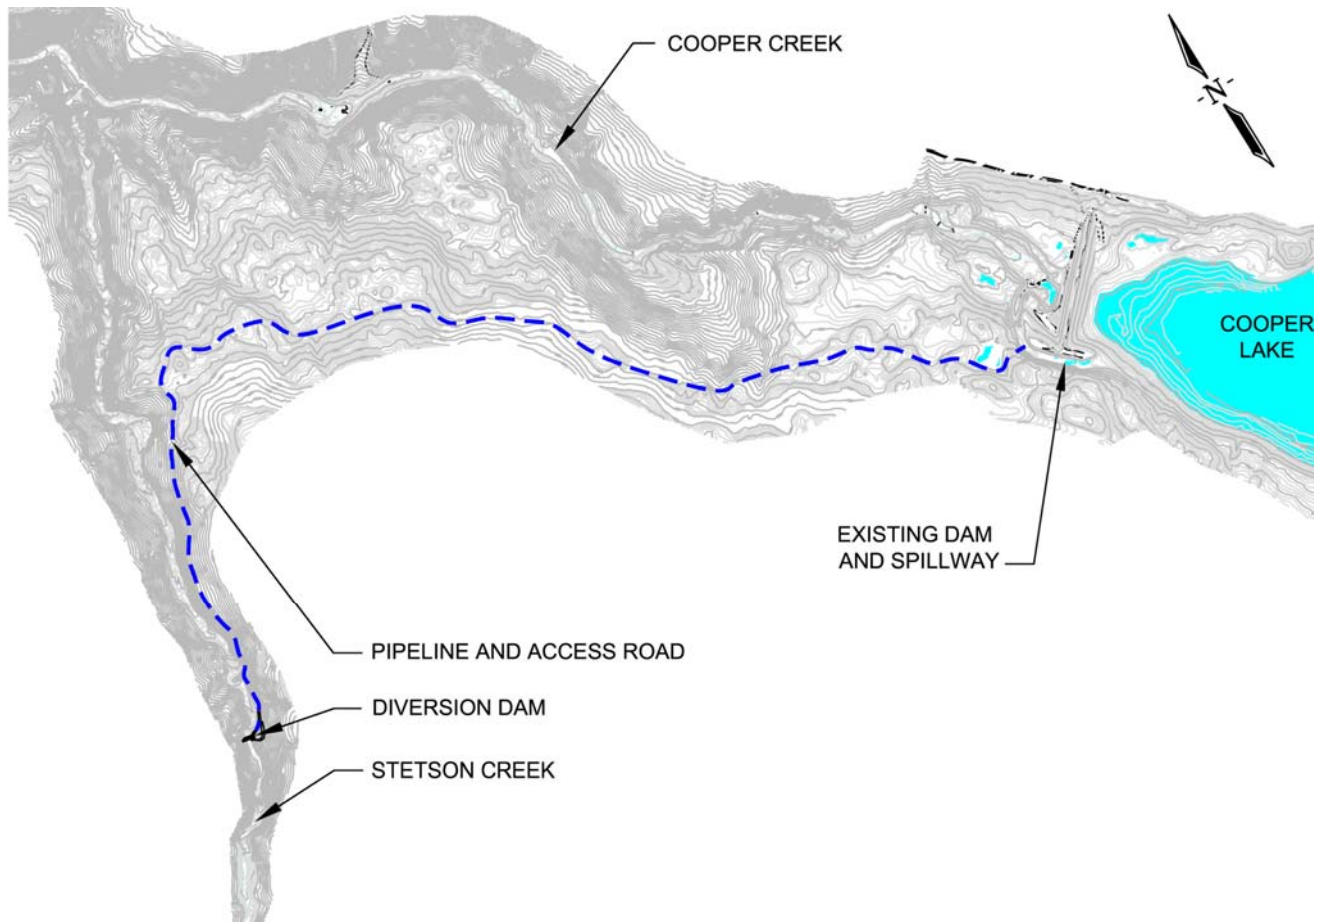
Plan of Stetson Creek Diversion and Pipeline to Cooper Creek
